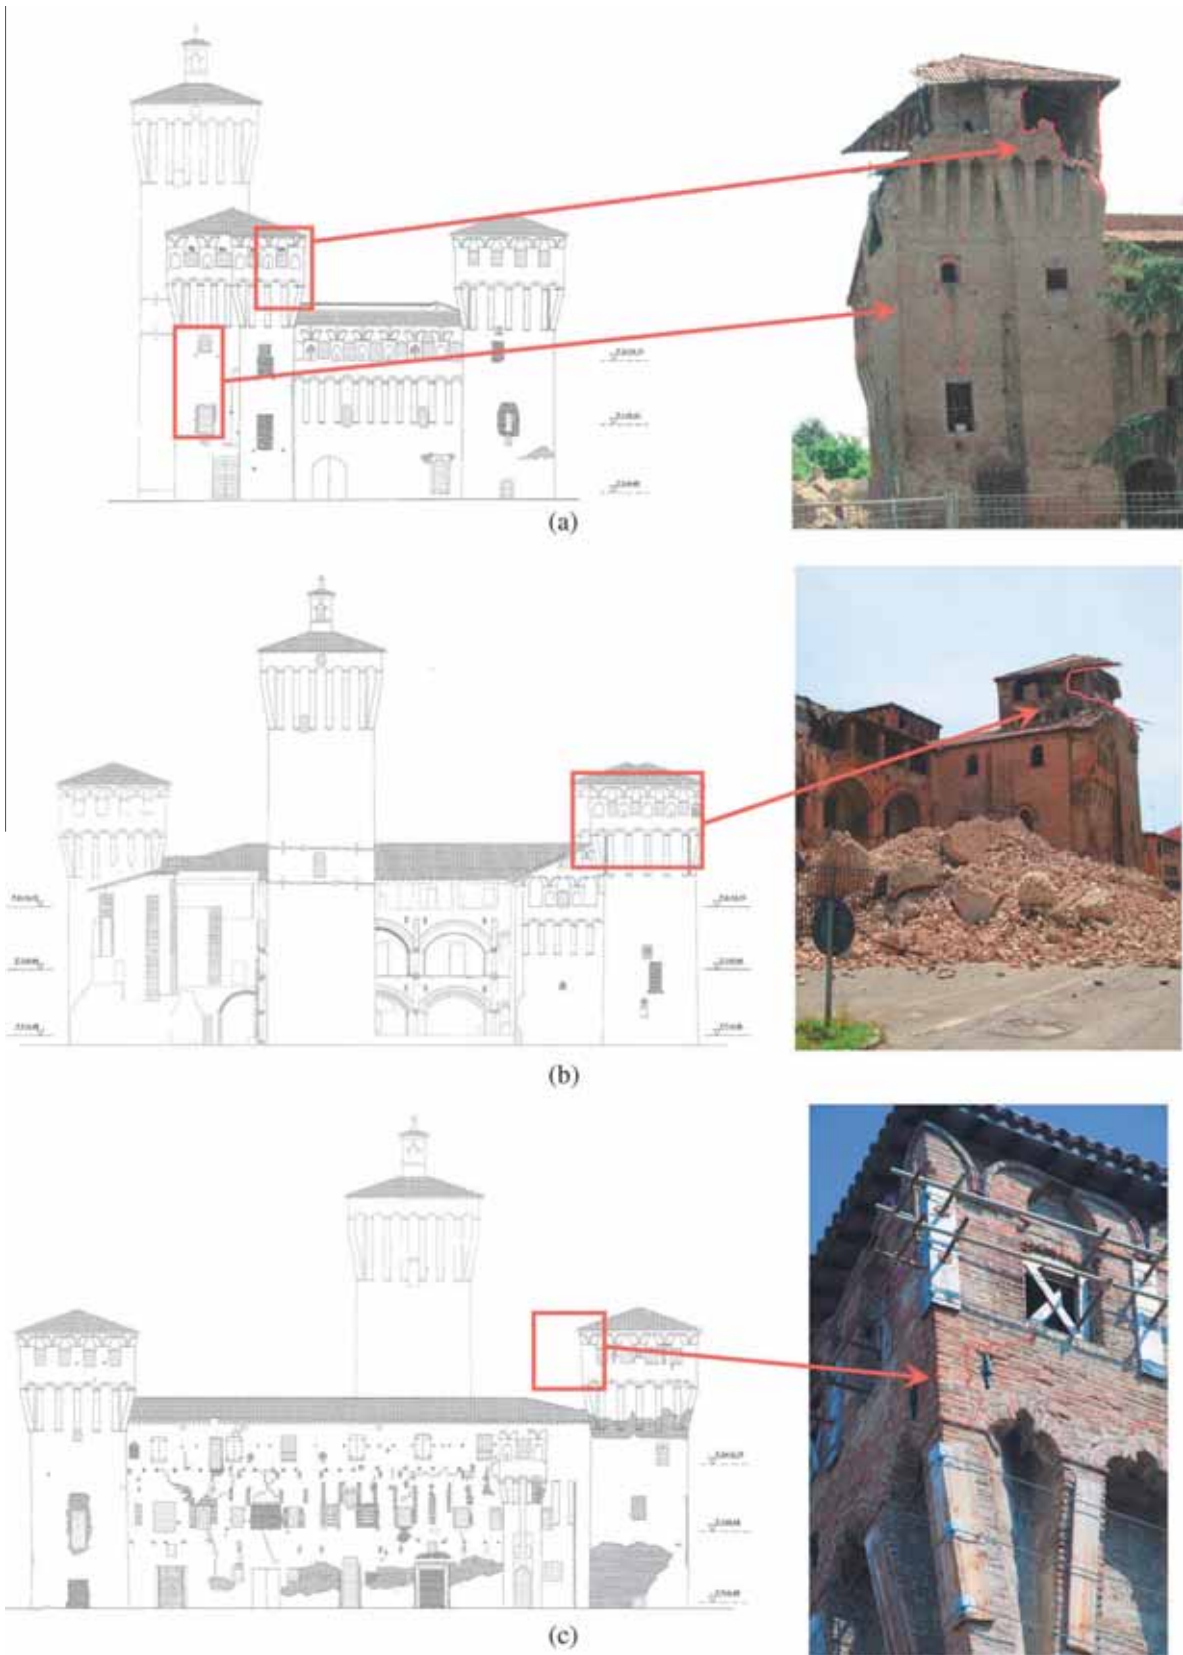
Corner out-of-plane overturning and cracks in the West Tower (a, seen from Southwest), out-of-plane overturning in the West Tower (b, seen from Northwest) and cracks in the East tower (c).
